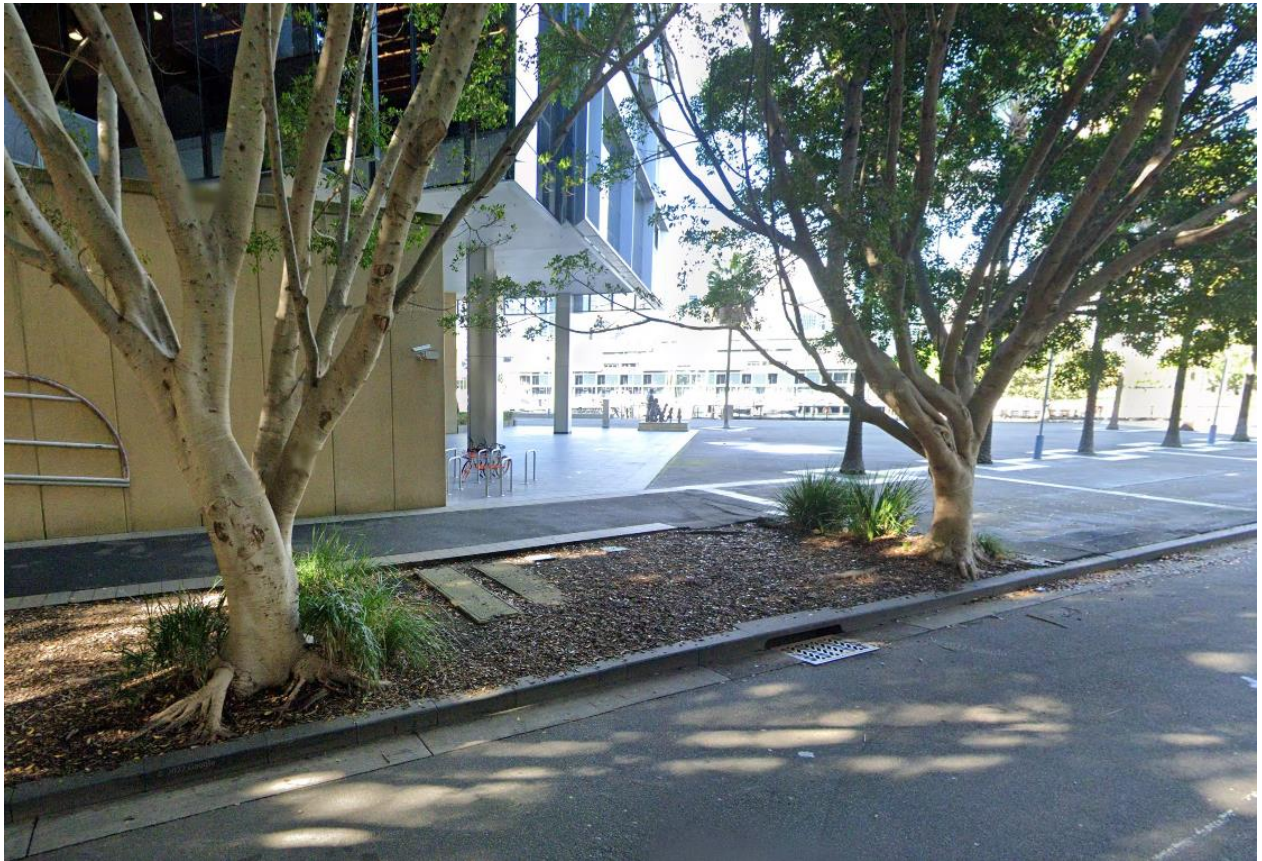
East facing from the Pirrama Road sag point (pit location) with overflows likely to flow across the open undercroft area at the southern end of 48 Pirrama Road, *Google Streetview*.
